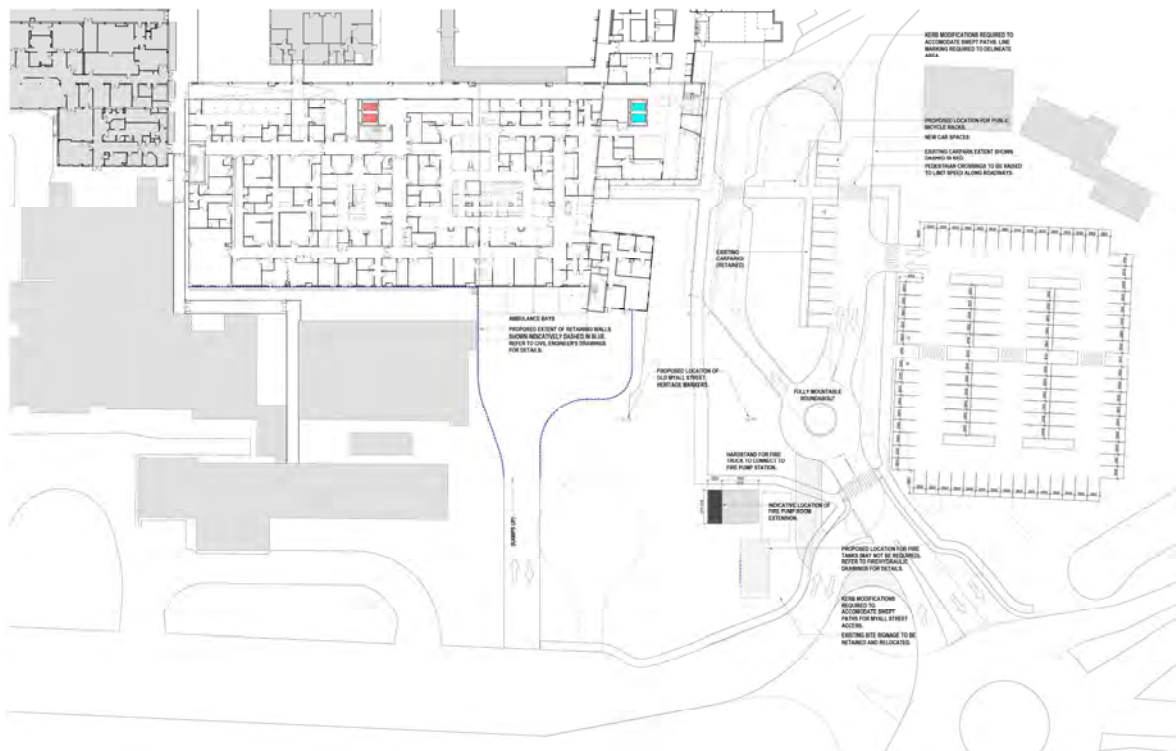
Detailed Ground Plan – The Myall Street forecourt of the large clinical building will be made up of parking, driveways and planting – Rice Daubney 2016
